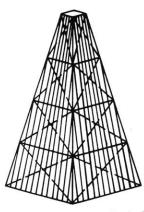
Trussed tubular frame with sloping exterior columns
